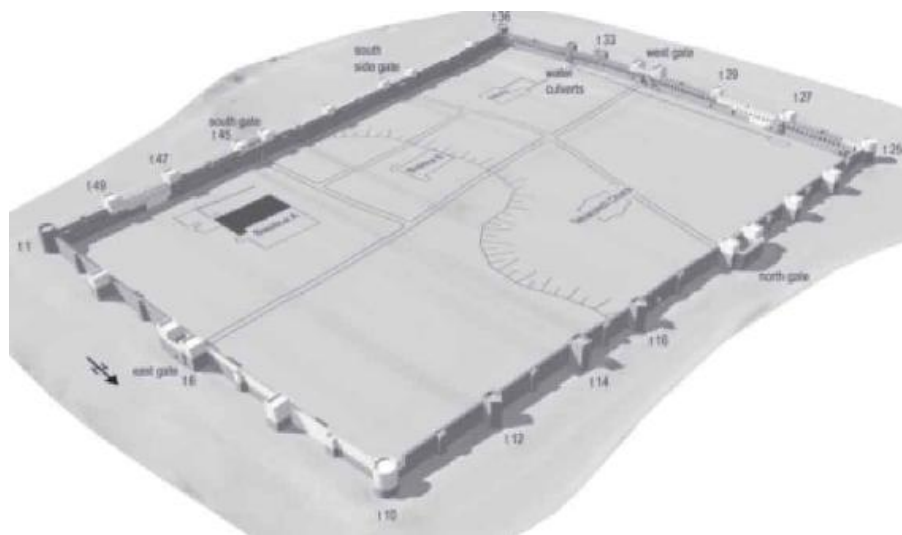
Resafa, city wall, reconstruction of building stage 3, finishing off. Closing the last gaps without a wall walk behind the arcades at t6–t10, at t27–t29 and at t47–t49; finishing towers (N. Erbe & C. Hof)..
